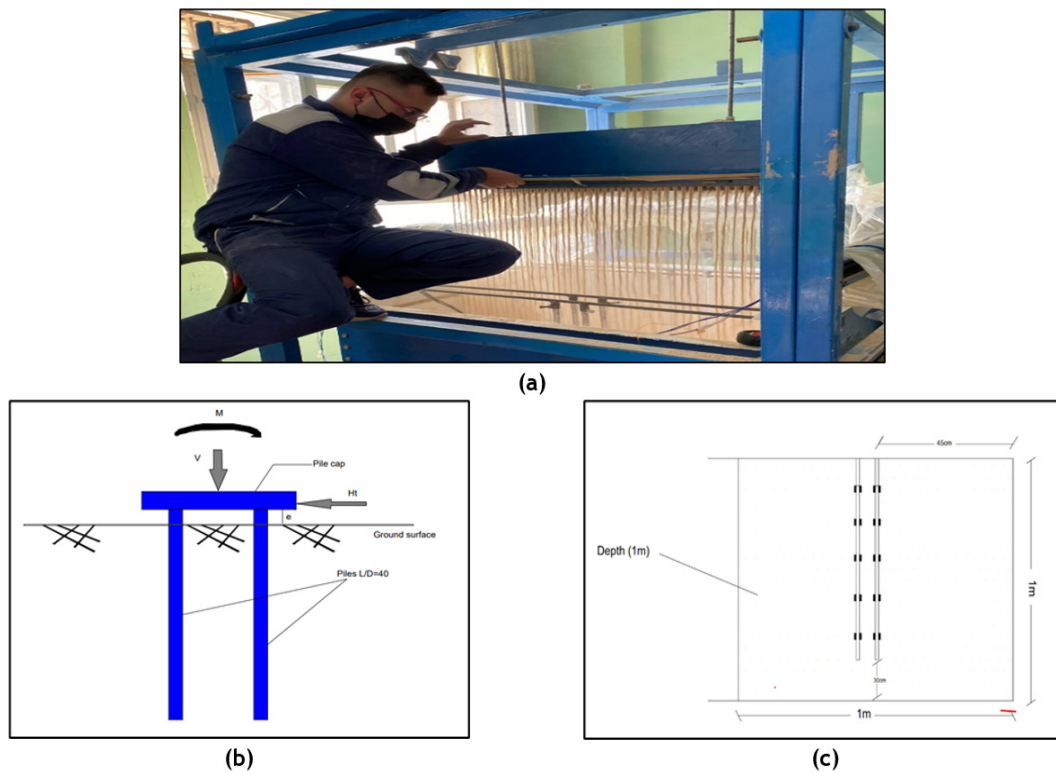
(a) piles installation and raining technique (b) schematic view one-way loading on group piles (c) Sketch of steel container dimensions
